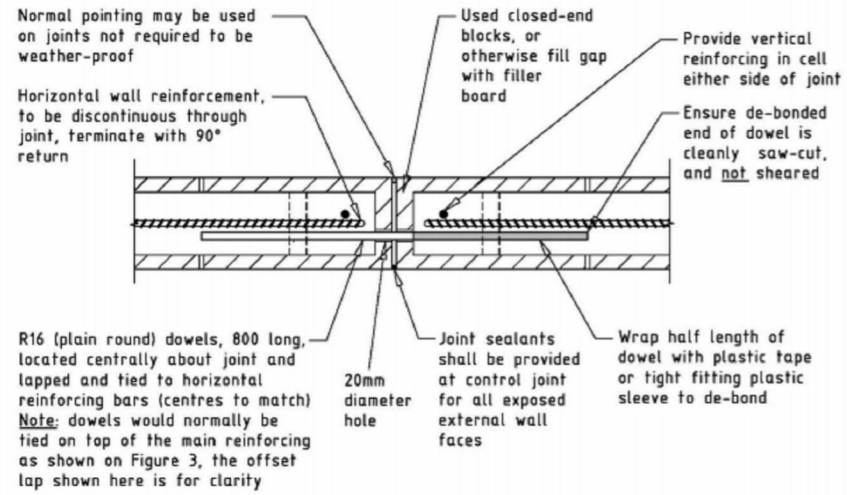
Control joint detail for solid and partial fill walls (does not apply to bond beam and lintel reinforcing)
